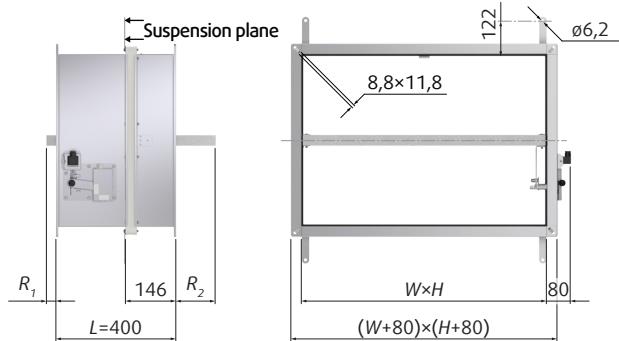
Dimensions of the manual rectangular fire damper PKIS
